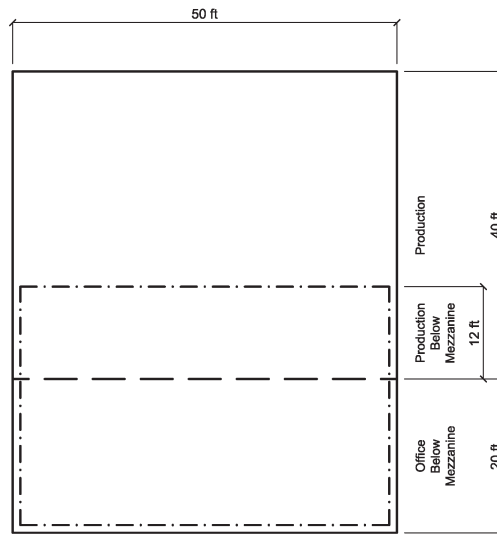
Modified Building: 50 ft x 60 ft x 20 ft building with 50 ft x 32 ft mezzanine
